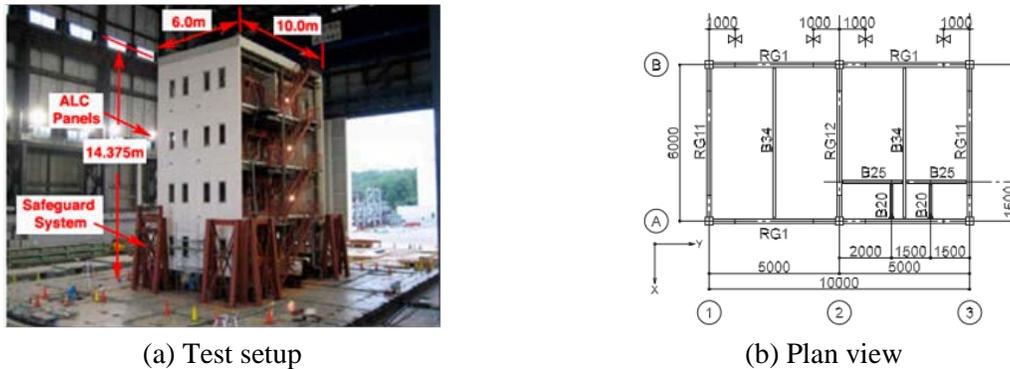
Full-scale collapse test of a four-story steel frame building with MRFs (adopted from [24])
